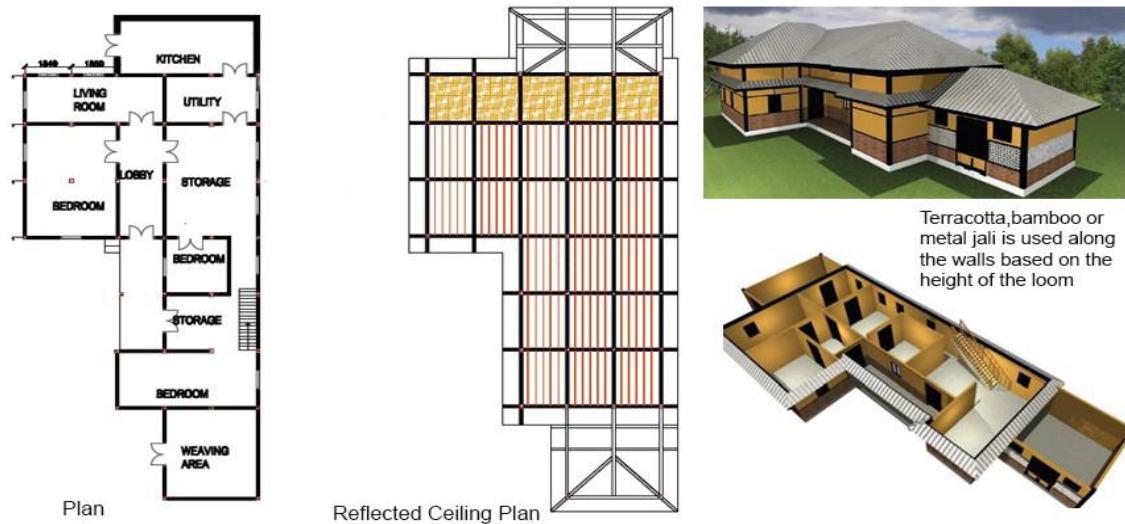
, A traditional house plan showing a weaving room with fenestrations based on the height of the loom
